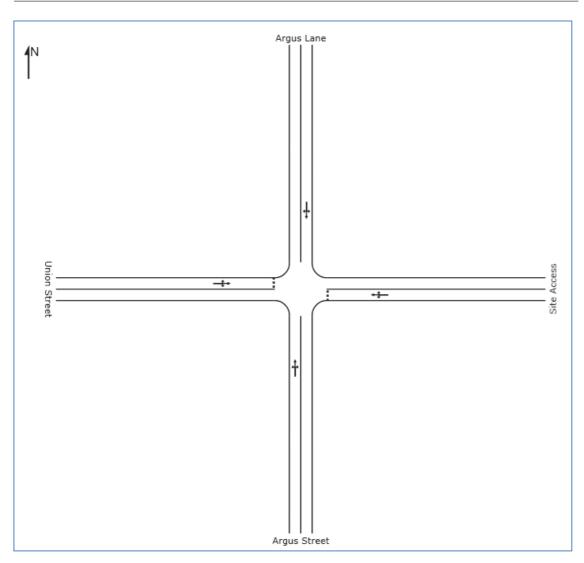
Proposed Argus Lane/Union Street/Site Access Intersection Layout
